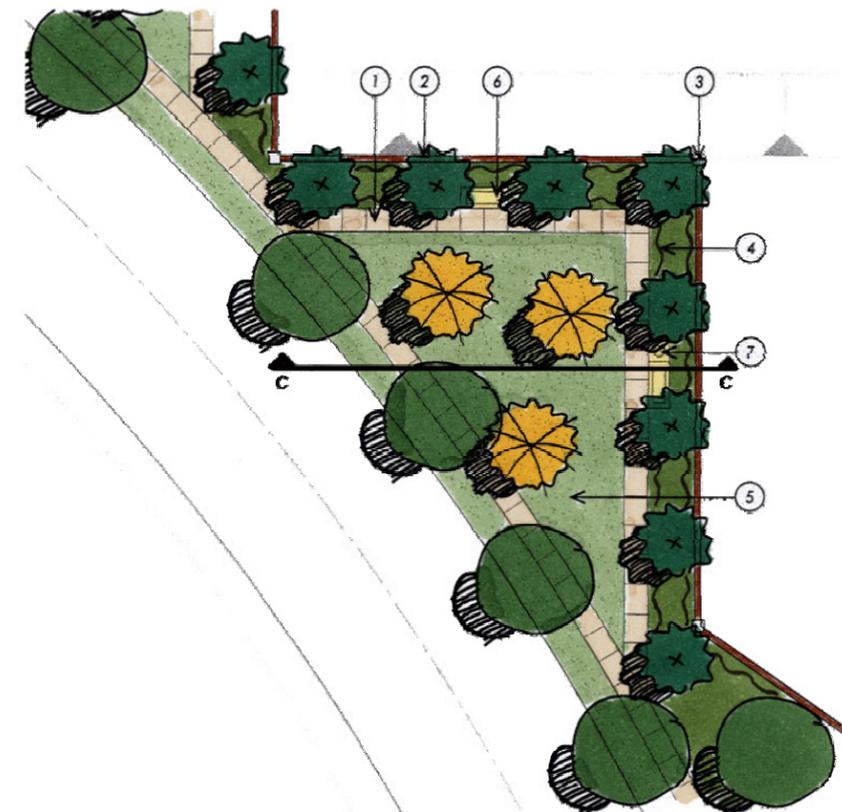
, "Primary Active Open Space Conceptual Site Plan"
